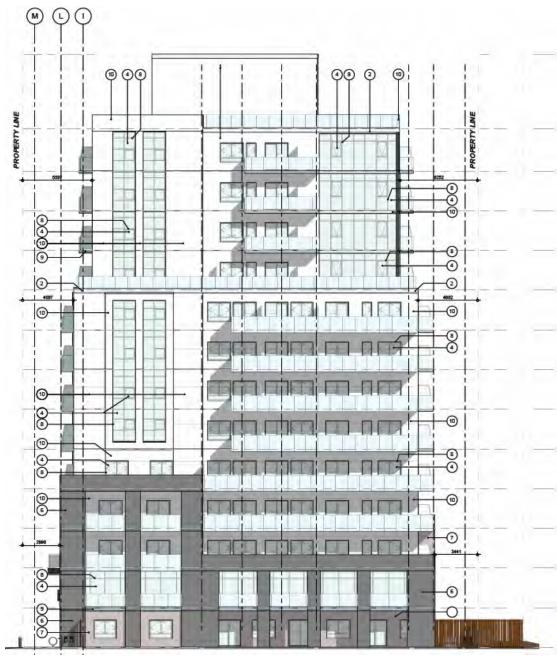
Proposed East Elevation Plan prepared by SRM Architects Inc.
